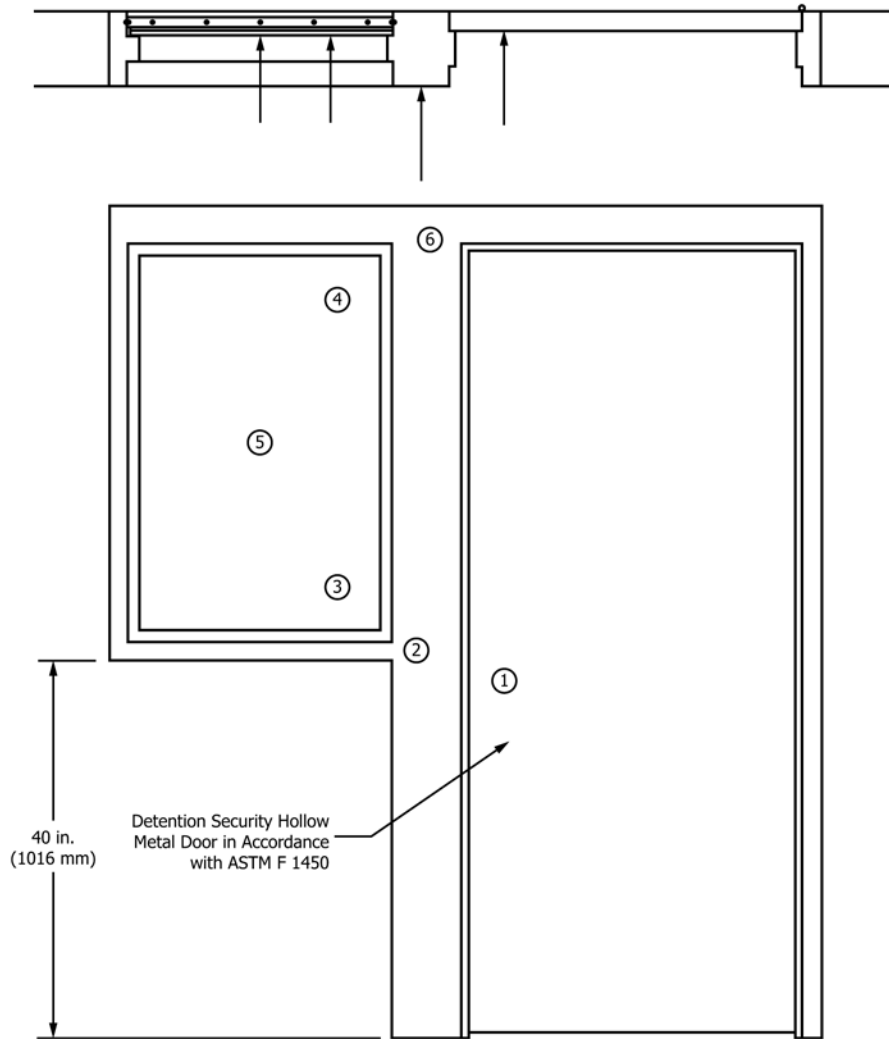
Test Assembly Elevation Location of Strike Points Described in Table 2
